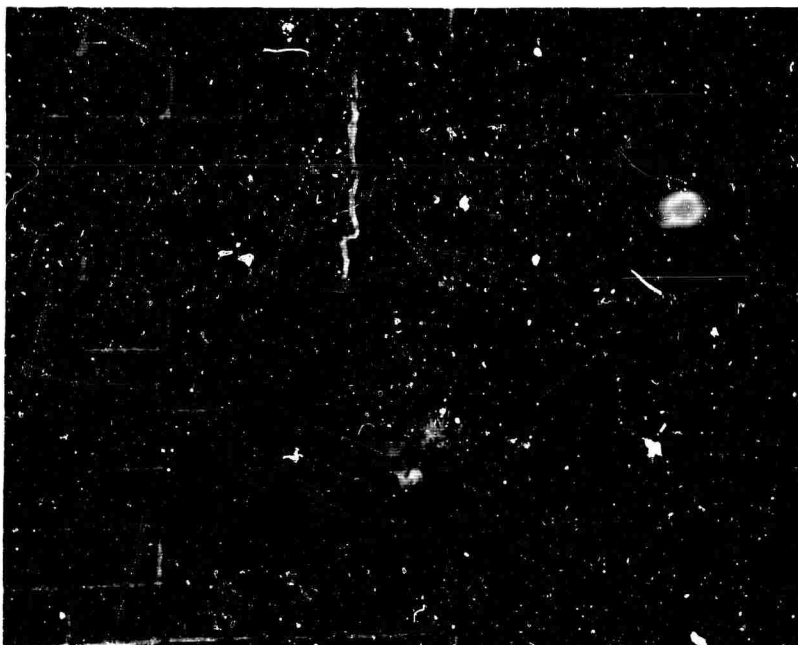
Postshot Cracks in H&N No. 55 Chimney
